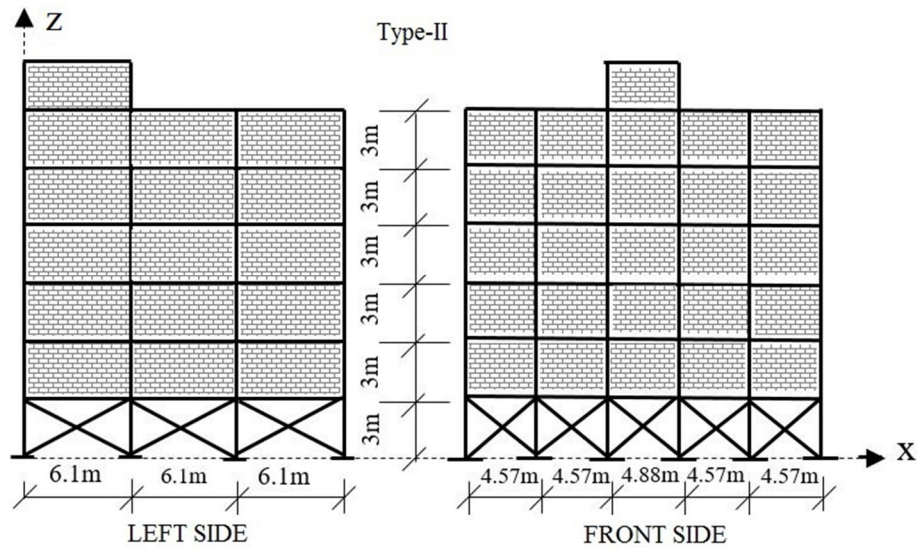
Elevation of first soft story in six storied building with bracing Type-II (double diagonal)
